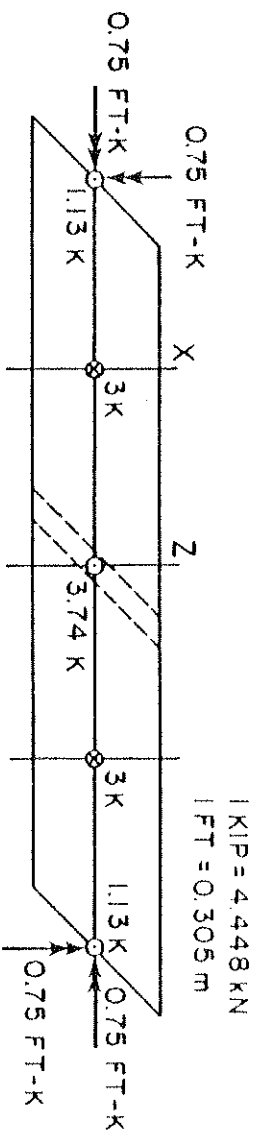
CENTERLINE REACTIONS FOR TWO SPAN SKEW BOX GIRDER
